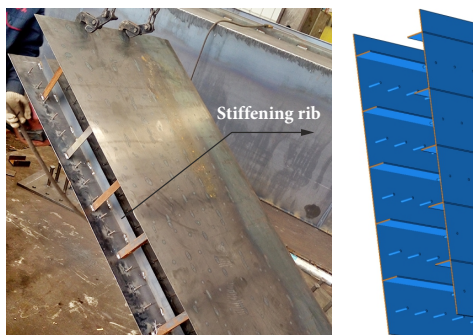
Connection between steel faceplate and wall base of SCWA and SCWB
